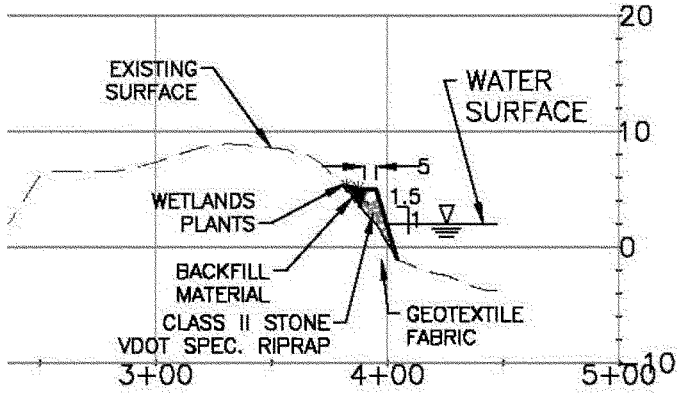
NARROWS TO RAINEY GUT CROSS SECTION
